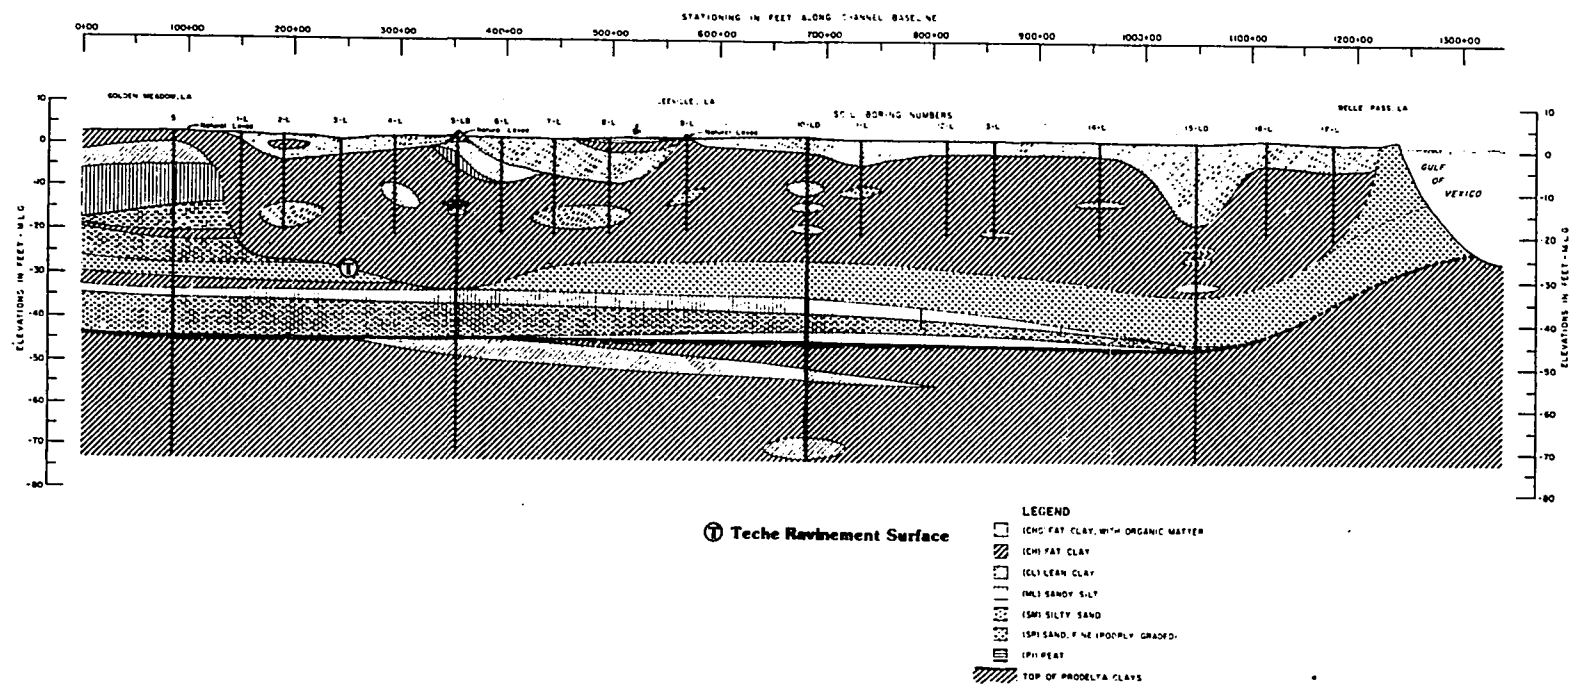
An USACE (1962b) engineering cross section illustrating the Teche shoreline and ravinement surface (see Figure E-15 for location).
